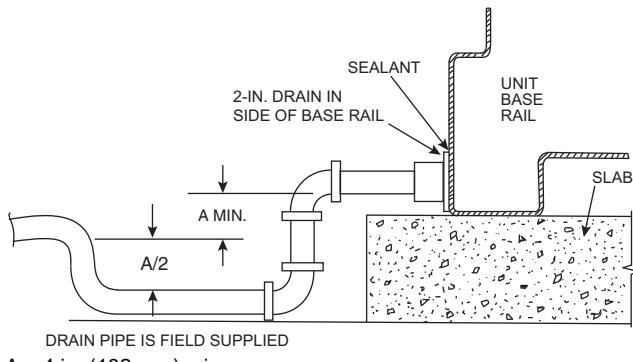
Primary Condensate Drain Piping Details (Slab and Curb Mounted)
